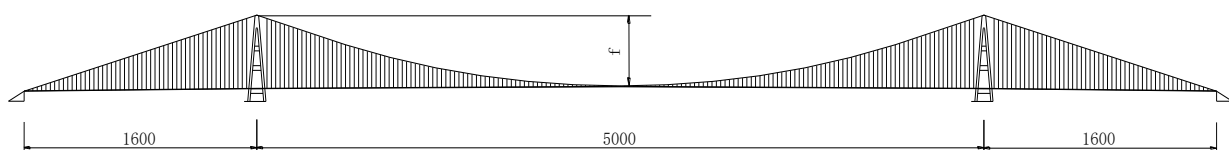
Elevation of the 5,000m spanned suspension bridge (Unit: m)
